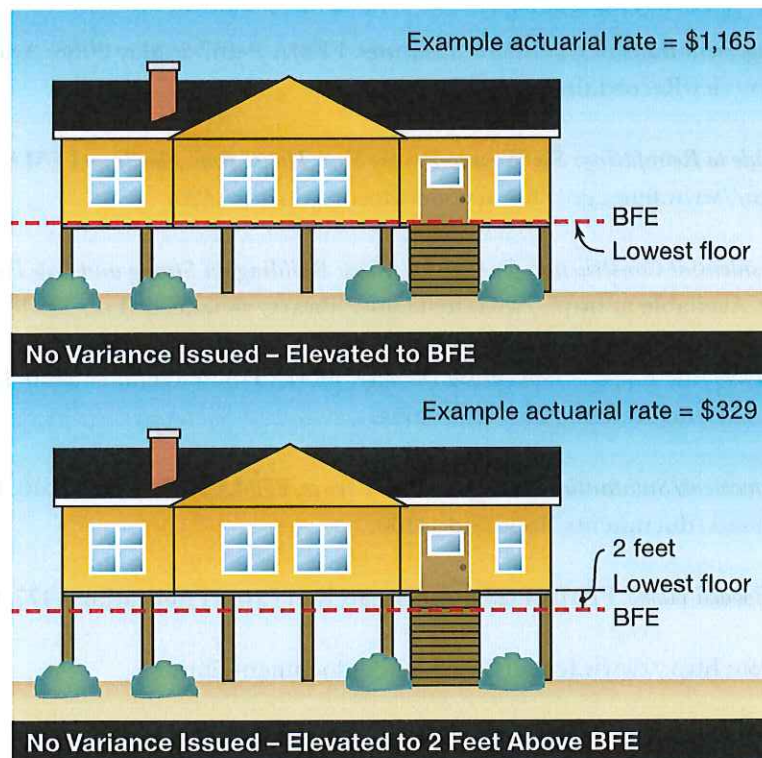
Two examples of repairs where no variance to the building shown in Figure 1. Note the example actuarial rates based on \$100,000 in building coverage.
